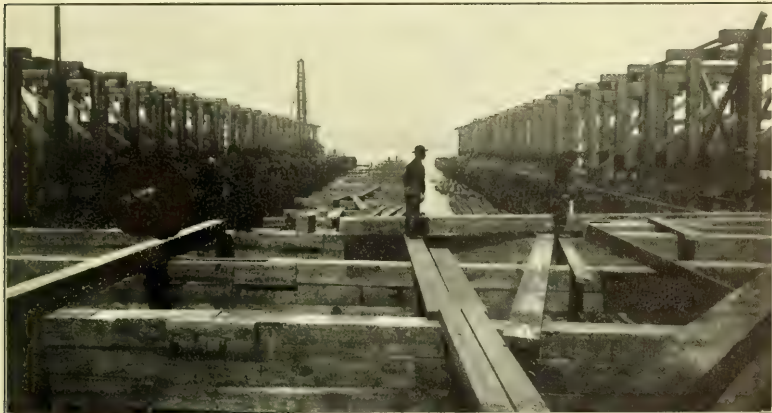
MATERIAL TRESTLE UNDER CONSTRUCTION ON PIER NO. 72, NORTH RIVER, SHOWING CLEAR WATER OVER TUNNEL LOCATION.
